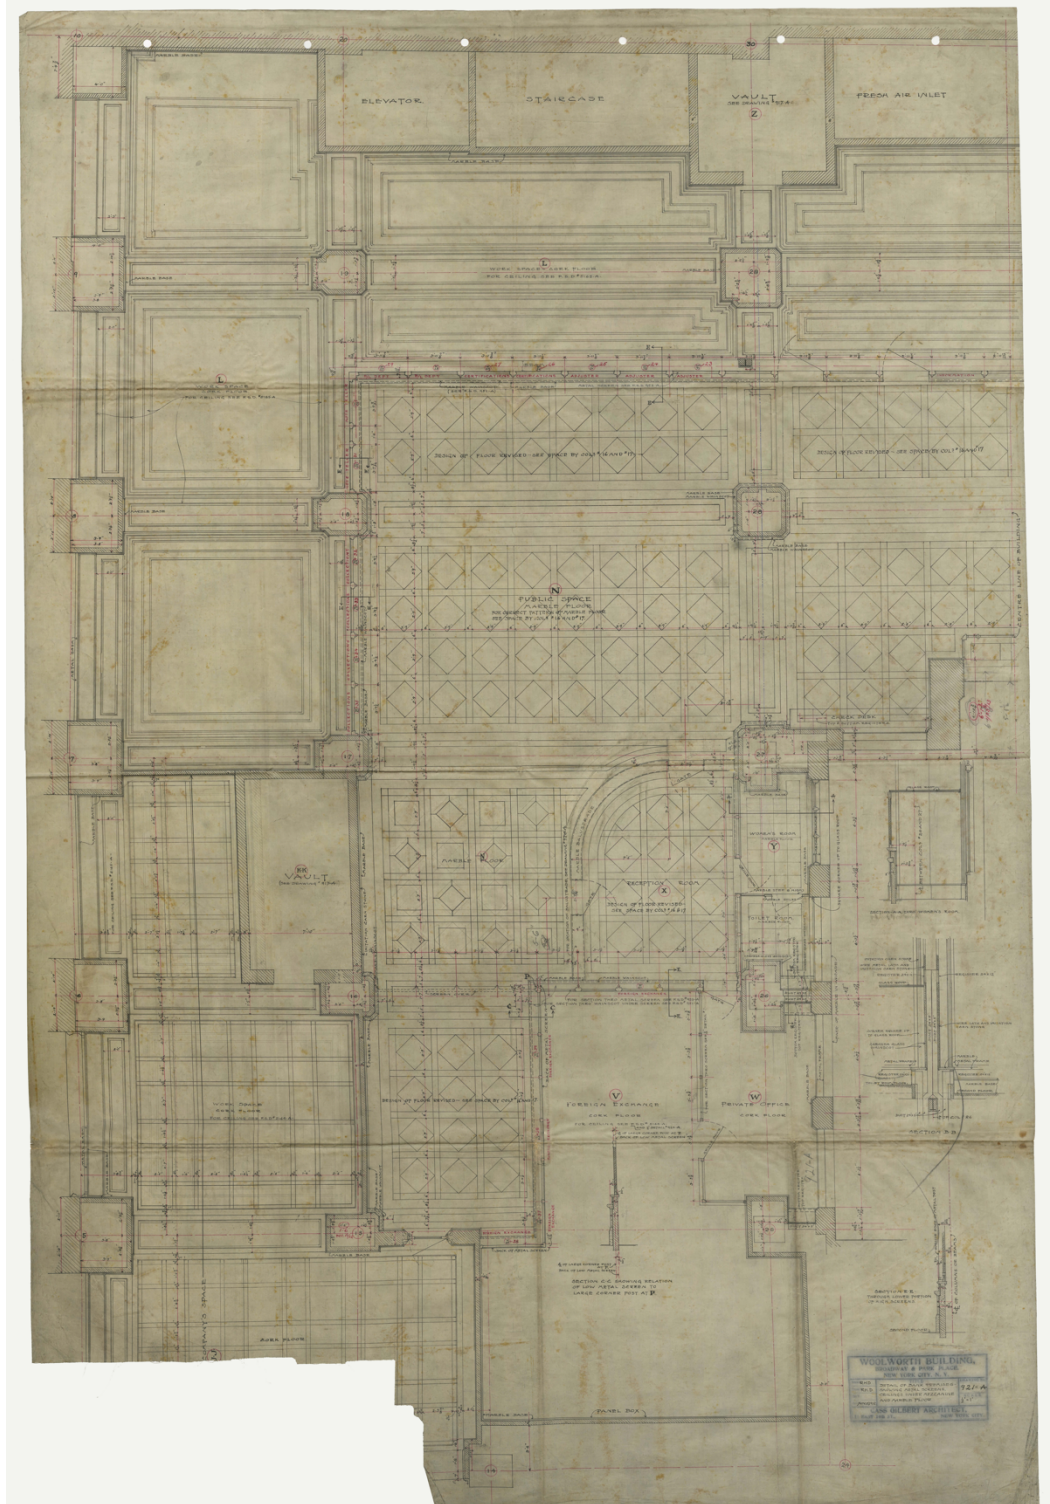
Southern half of the banking hall. Drawing No. 921A, "Detail of Bank Premises, Showing Metal Screens, Ceilings under Mezzanine and Marble Floor." The Office of Cass Gilbert. November 25, 1912. Vanderbilt University Fine Arts Collection.
